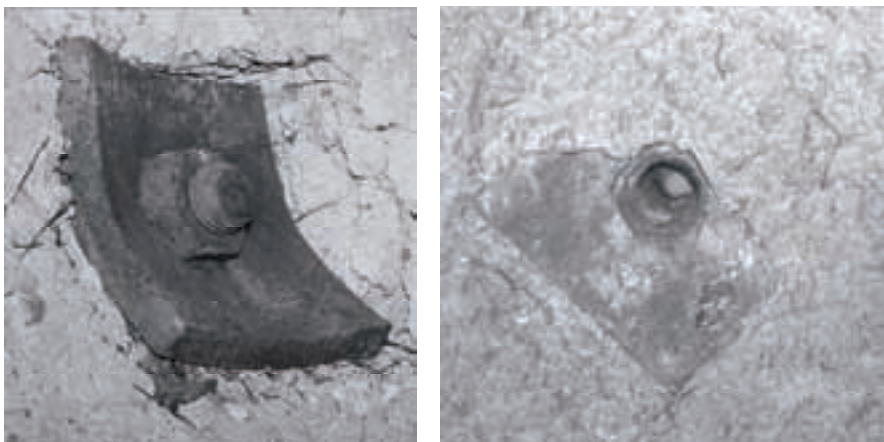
Fully-grouted rebar bolts installed in an overstressed weak rock. (Li, 2007)
